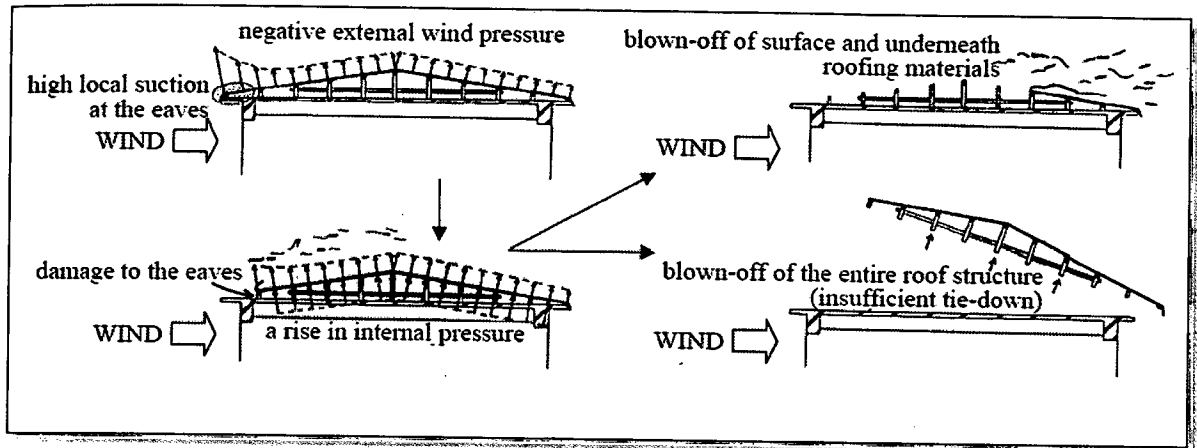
Wind Damage Correlation (Yukio Tamura.2009)
